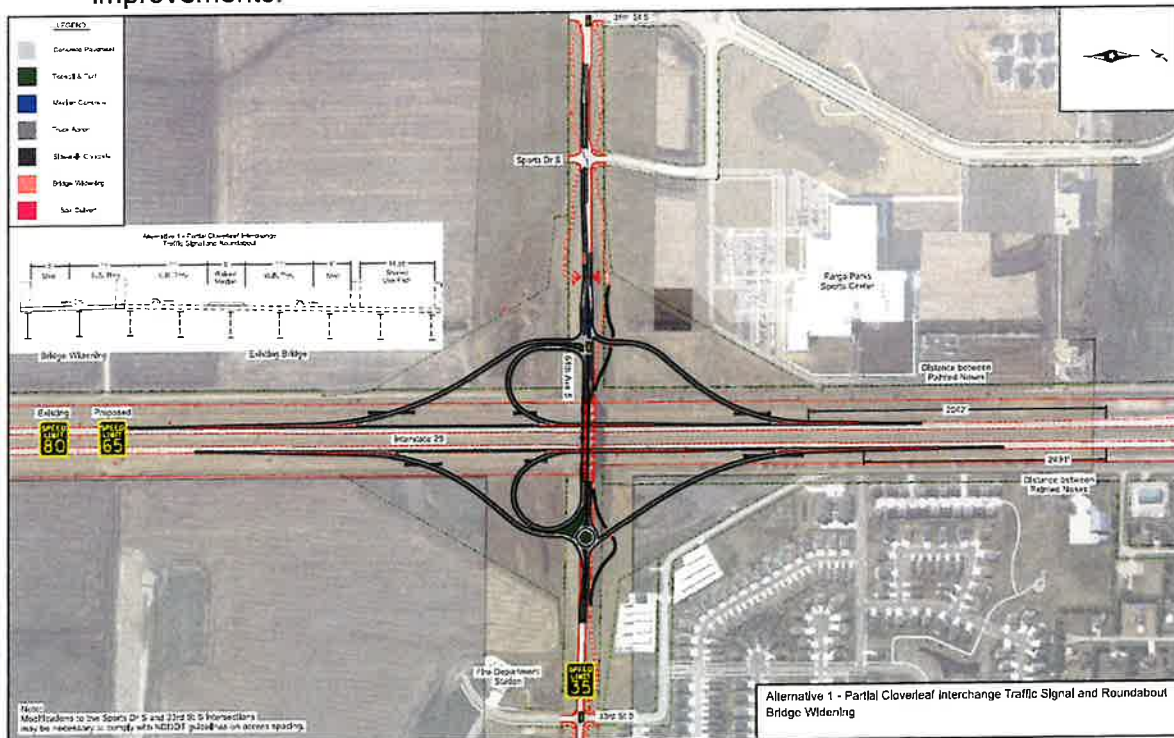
Alternative 1 Proposed Layout & Typical Section
